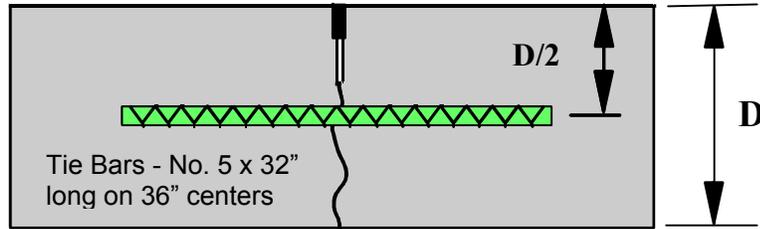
Longitudinal contraction joint placed between adjacent lanes. Note the crack through the concrete section.
